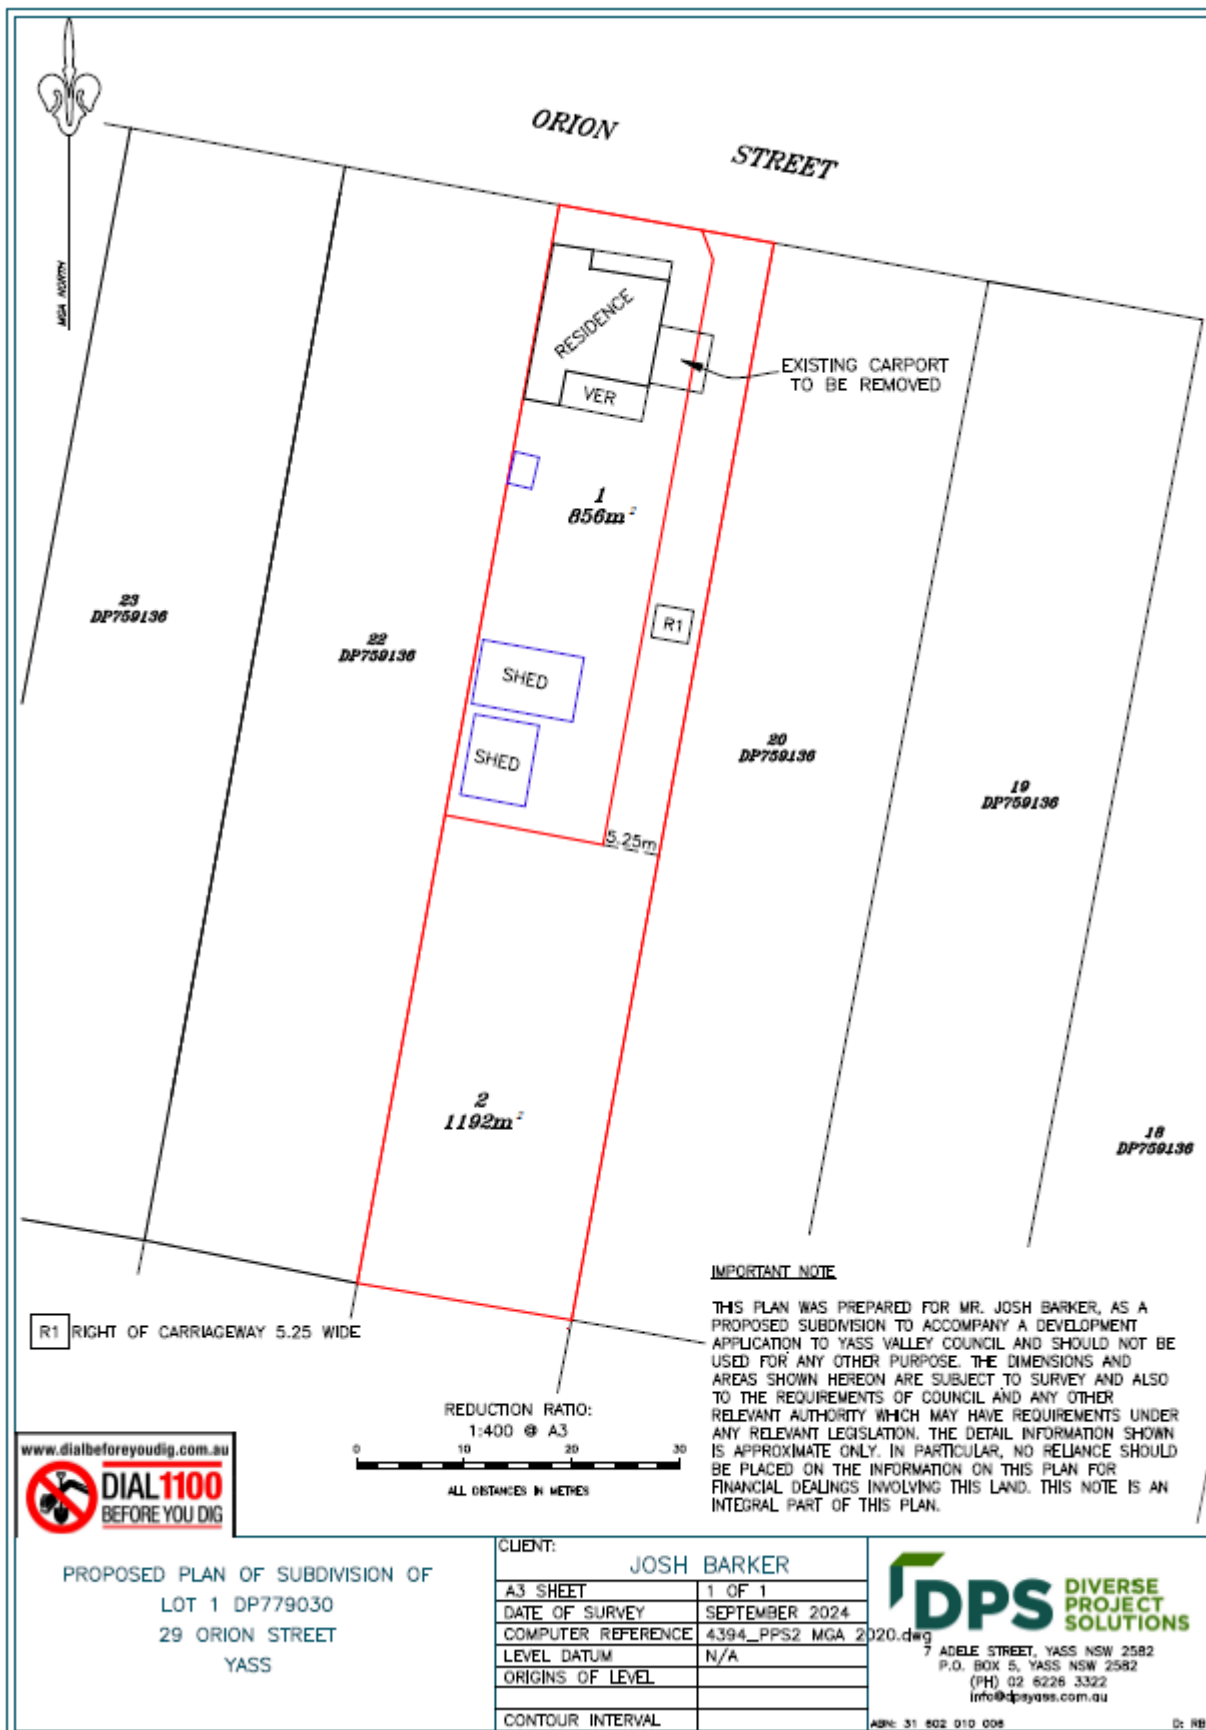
Proposed Plan of Subdivision (Source: DPS YASS P/L, September 2024)
